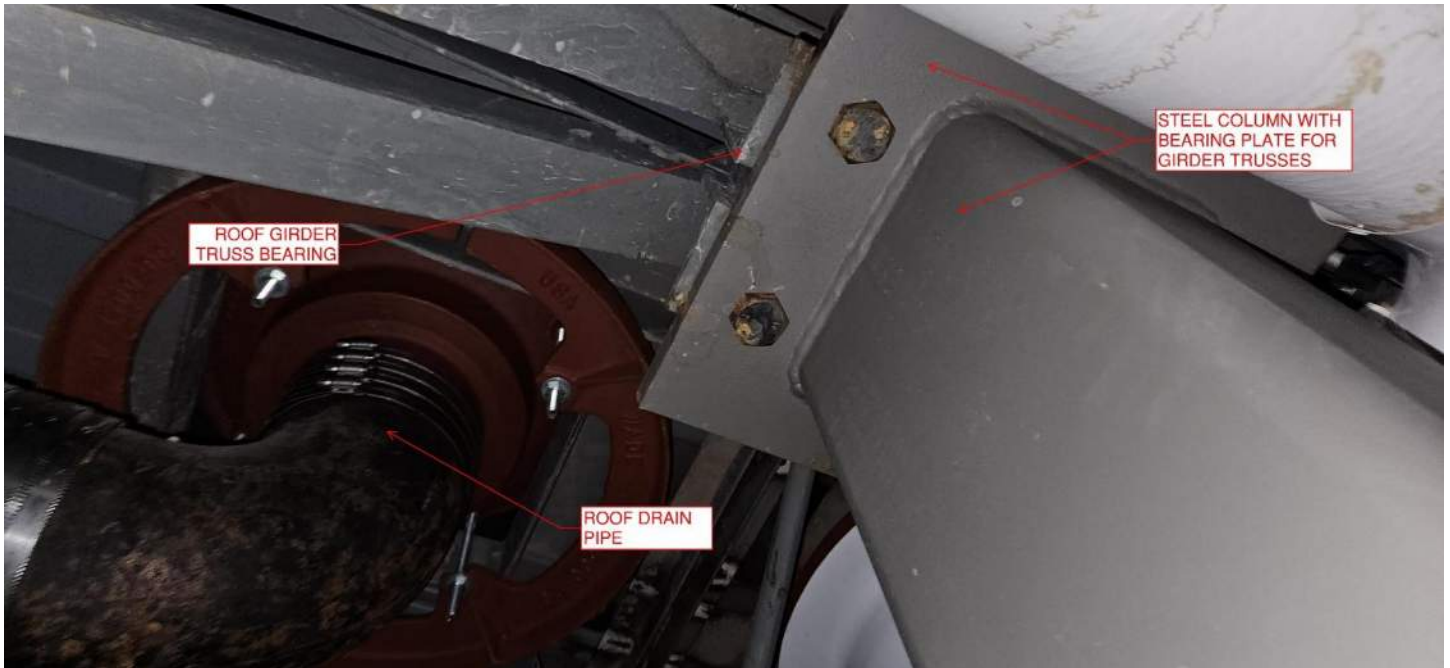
GIRDER TO COLUMN CONNECTION
